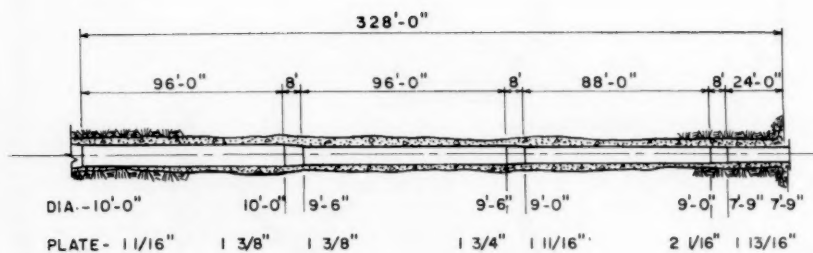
BERSIMIS No.1 PROFILE OF STEEL LINED SECTION OF PENSTOCK
